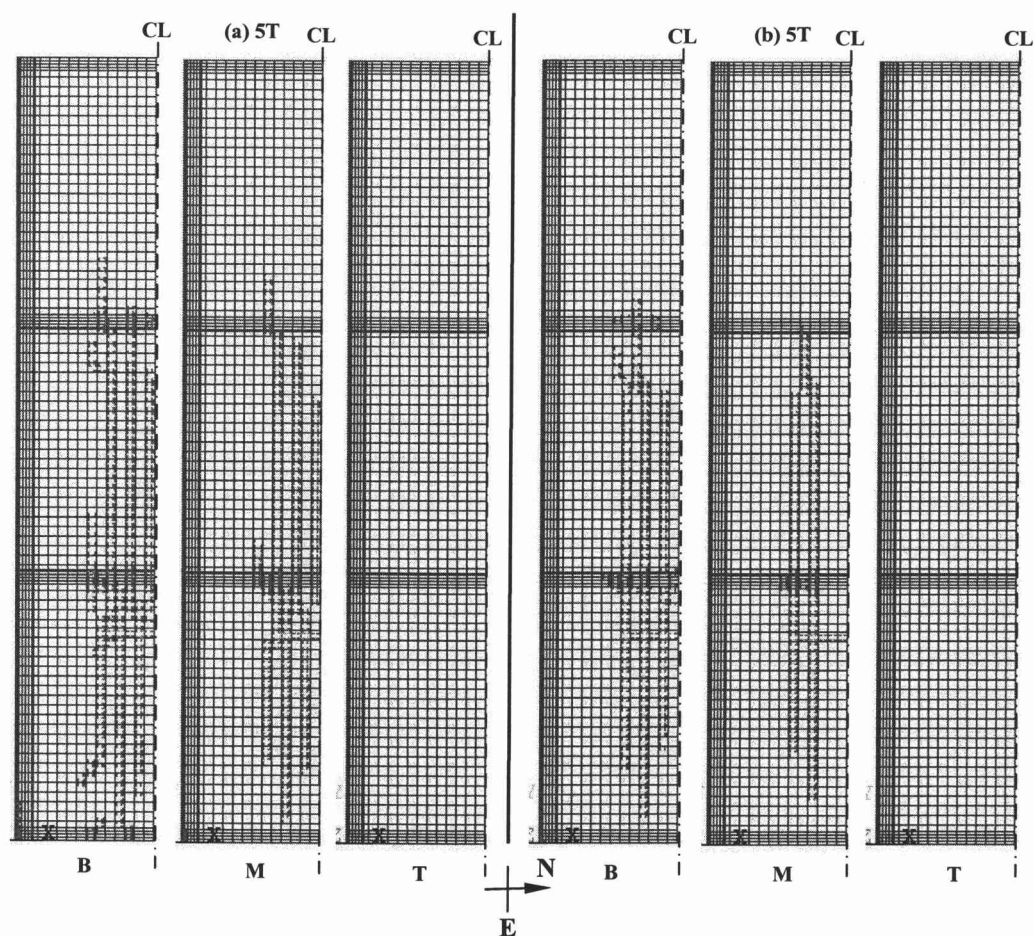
Crack Propagation in Bridge Deck (Scaled Truck Loading): (a) Unstrengthened Bridge; (b) FRP-Strengthened Bridge
